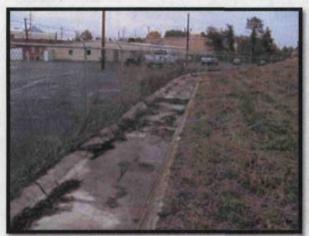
and Photograph 12: Concrete drainage swale, fence, and vegetation along northwestern side of Taracorp pile (view southwest).
